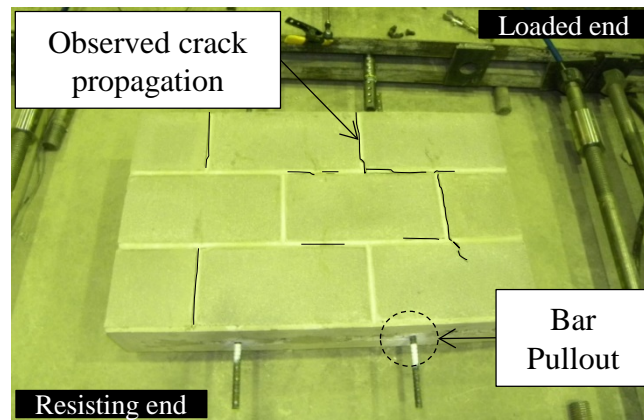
Typical bar pullout failure and crack propagation in a representative specimen – Specimen P250-1.
